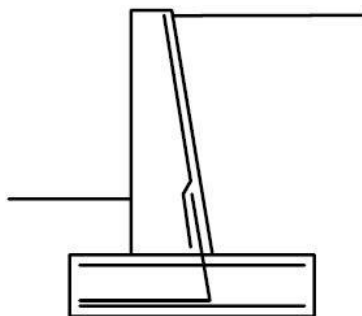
Main Reinforcement in RCC Cantilever Wing Wall
